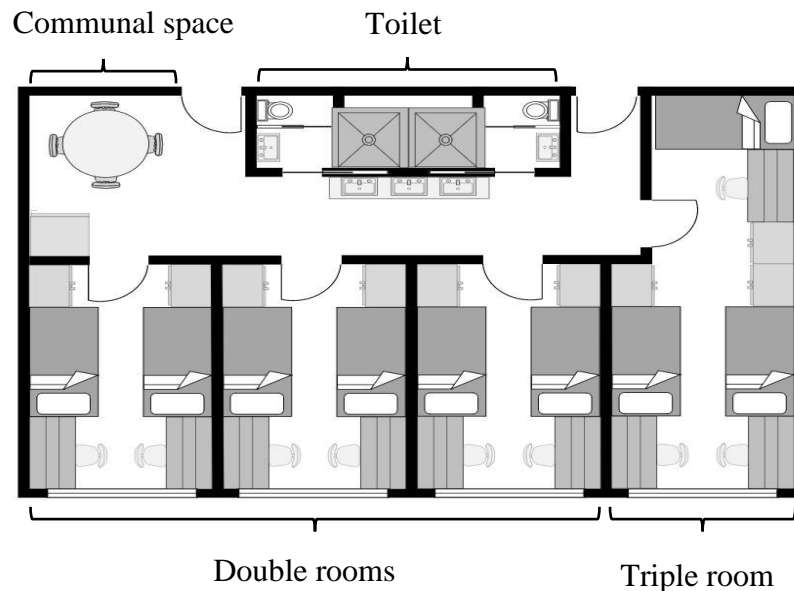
Layout of a typical 9-person suite with details of double rooms, triple rooms, communal space and toilet facility
